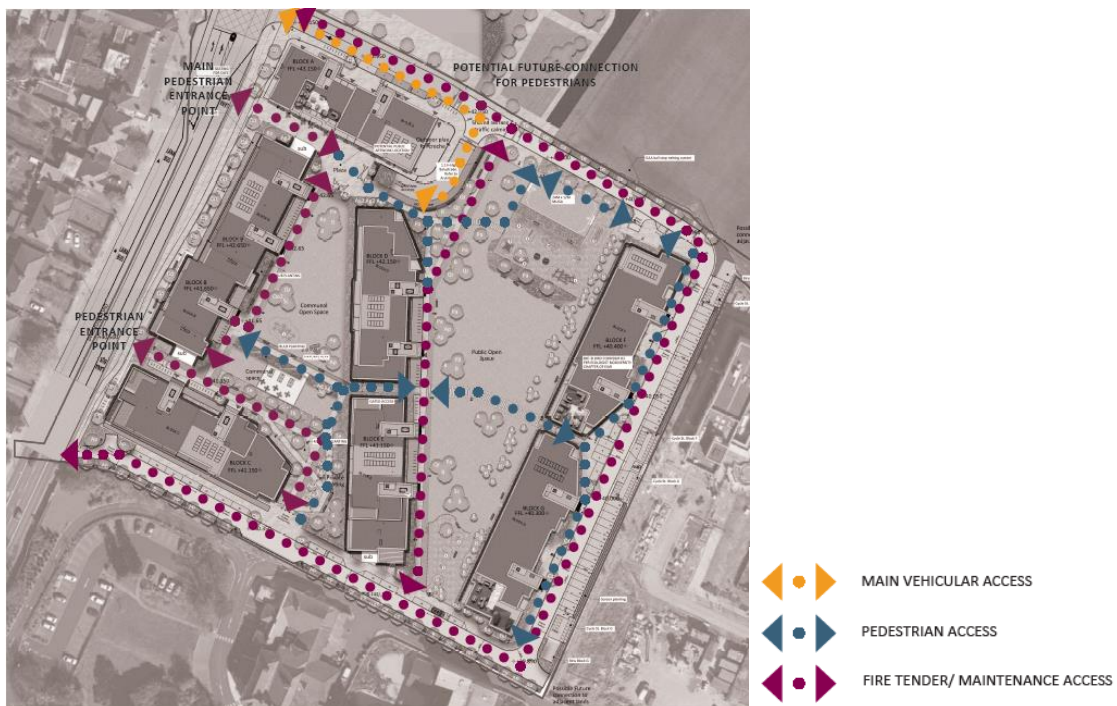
Extract from Parkhood Landscape Design Statement showing proposed street and pedestrian network
